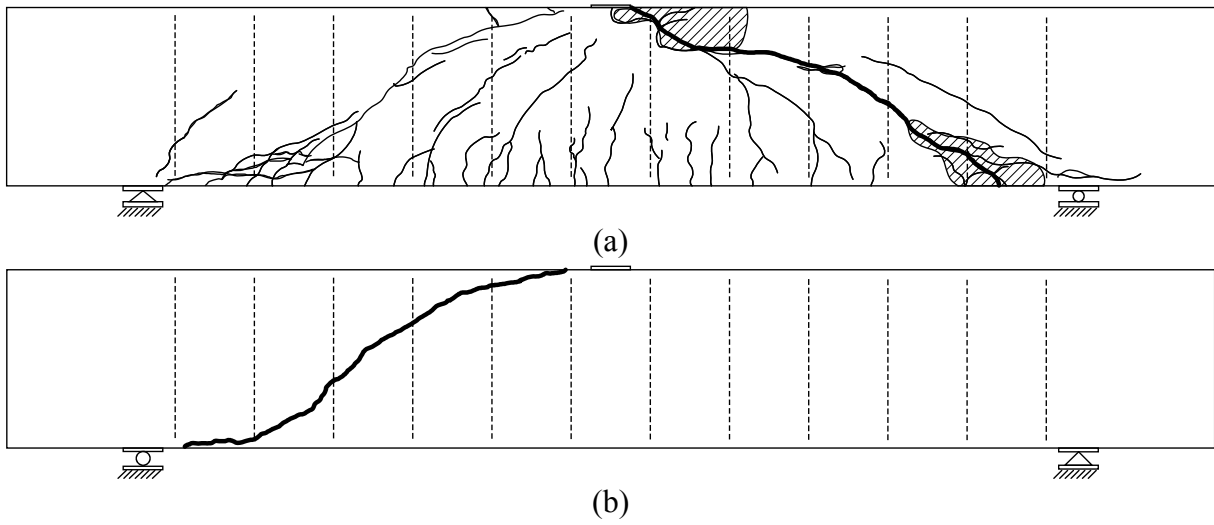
Observed damage in specimen P1S7, (a) front side, (b) back side
